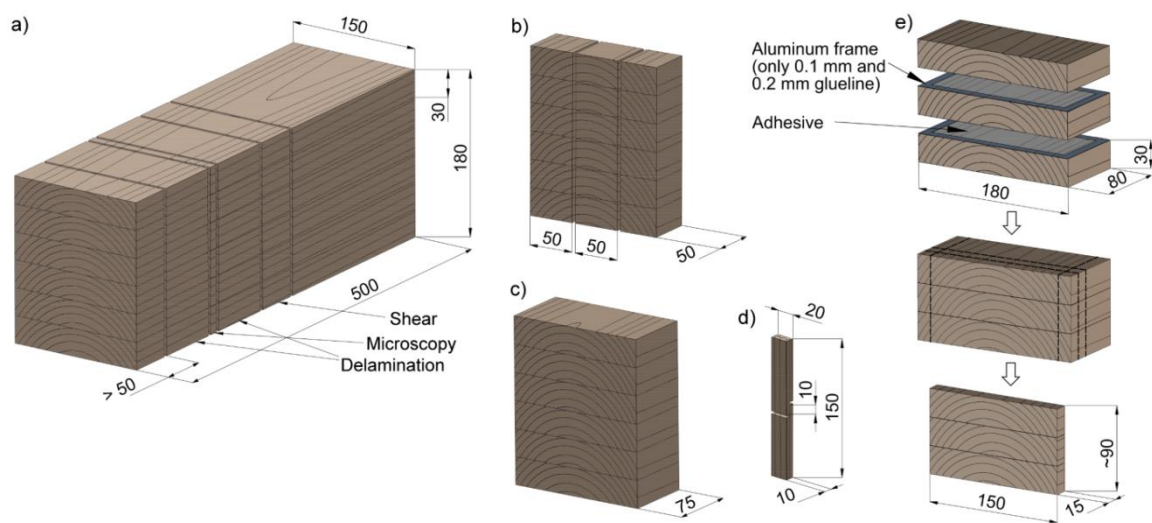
Overview of test specimens: a) Bonded member and cutting of test specimens, b) shear specimens, c) delamination specimen, d) tensile shear specimen, e) preparation scheme and specimen for strain measurement
